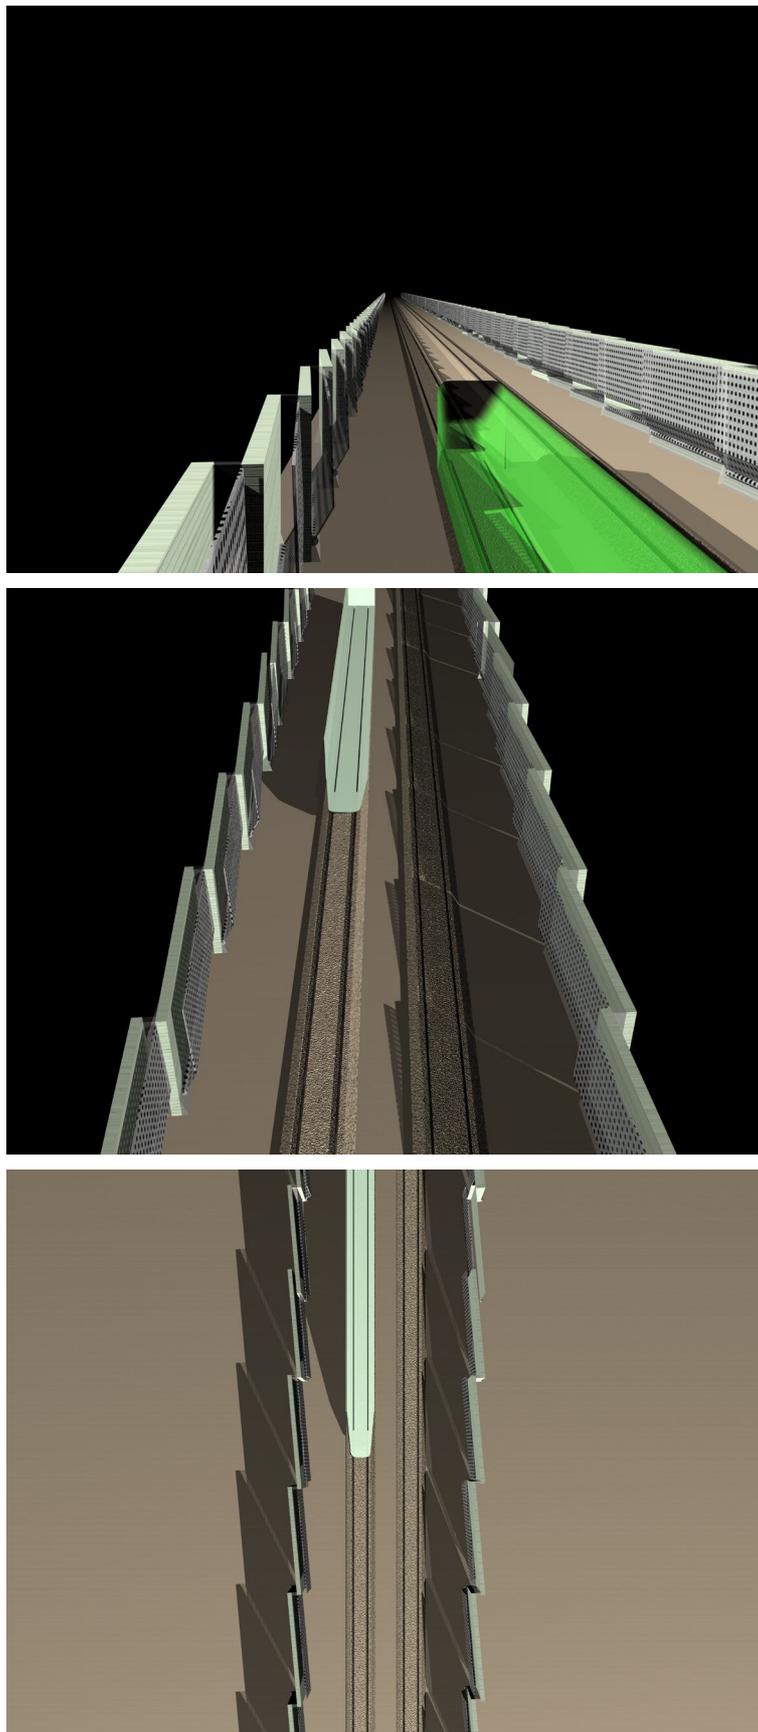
Aerial views of the proposed acoustic barriers
